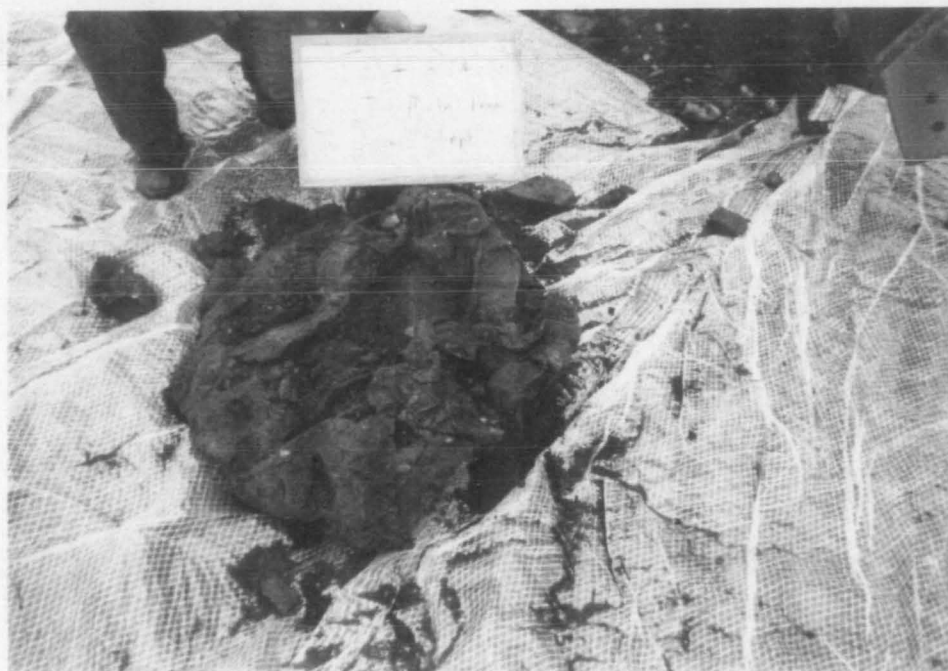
Test pit J showing smashed drum, with tar residue, removed from excavation.
